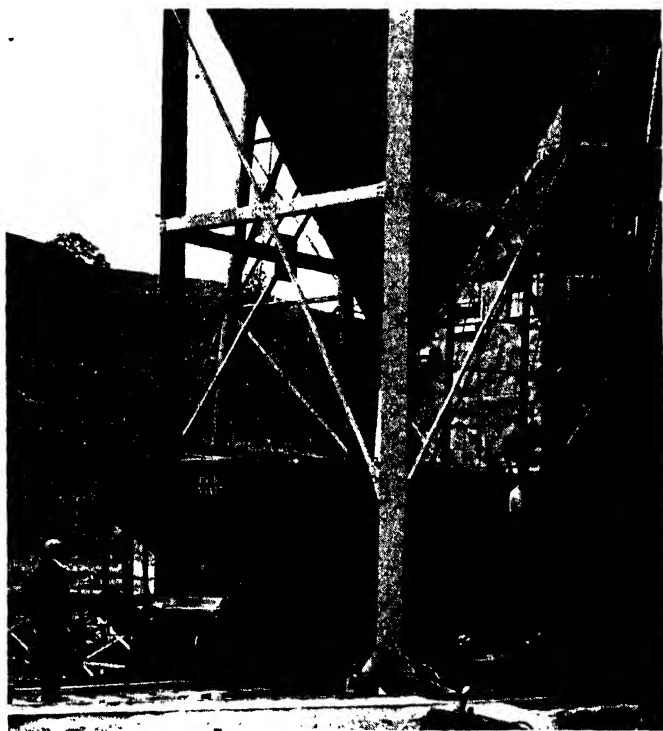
Hopper-bottom cement cars connected to underground pumps which blow cement into overhead silo.
